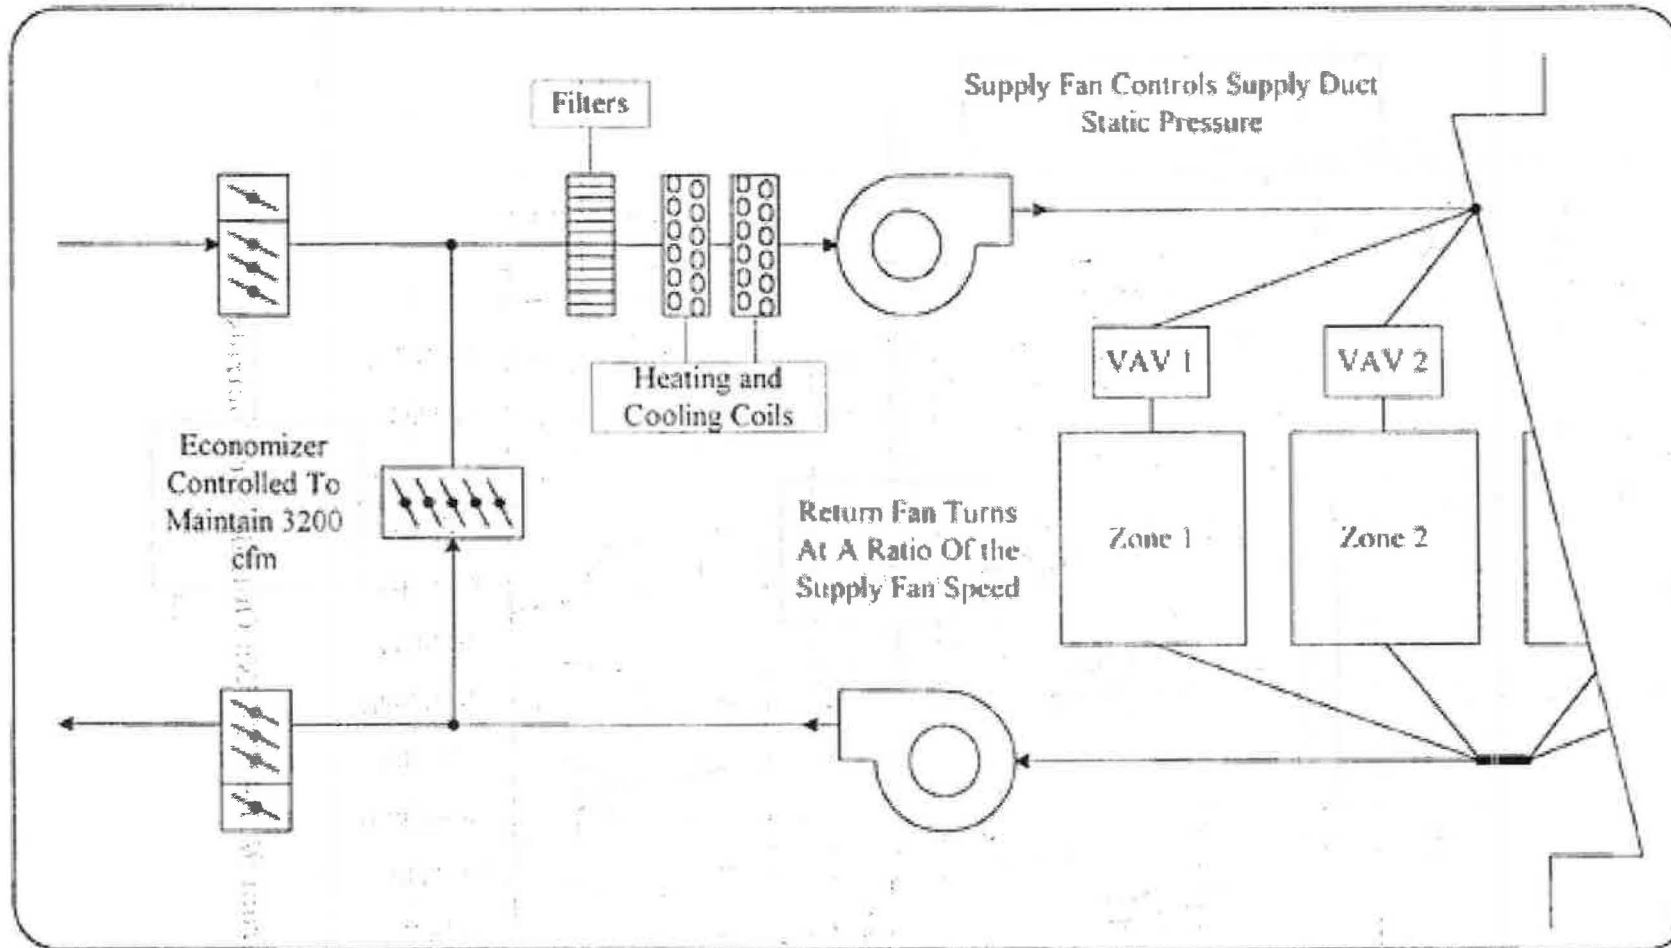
Castleman Hall Mechanical Equipment Layout
